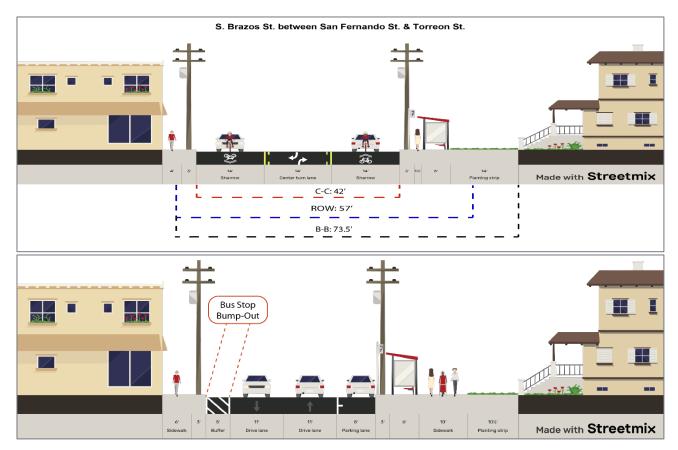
Existing and Proposed Cross-Section - South of San Fernando
